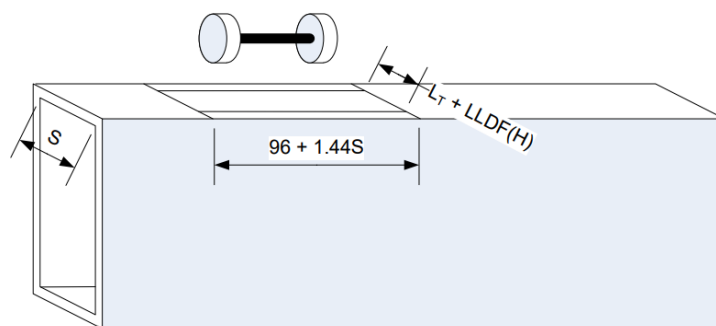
Live Load Distribution with Less than 2 ft. of Fill for Traffic Traveling Parallel to Span (Used with permission from *WisDOT Bridge Manual, Chapter 36 - Box Culverts*, developed by the Wisconsin Department of Transportation)
